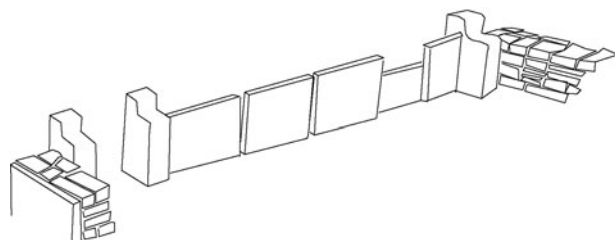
The reconstructed front wall (interior view). (Chen 2008, fig. 15.)
